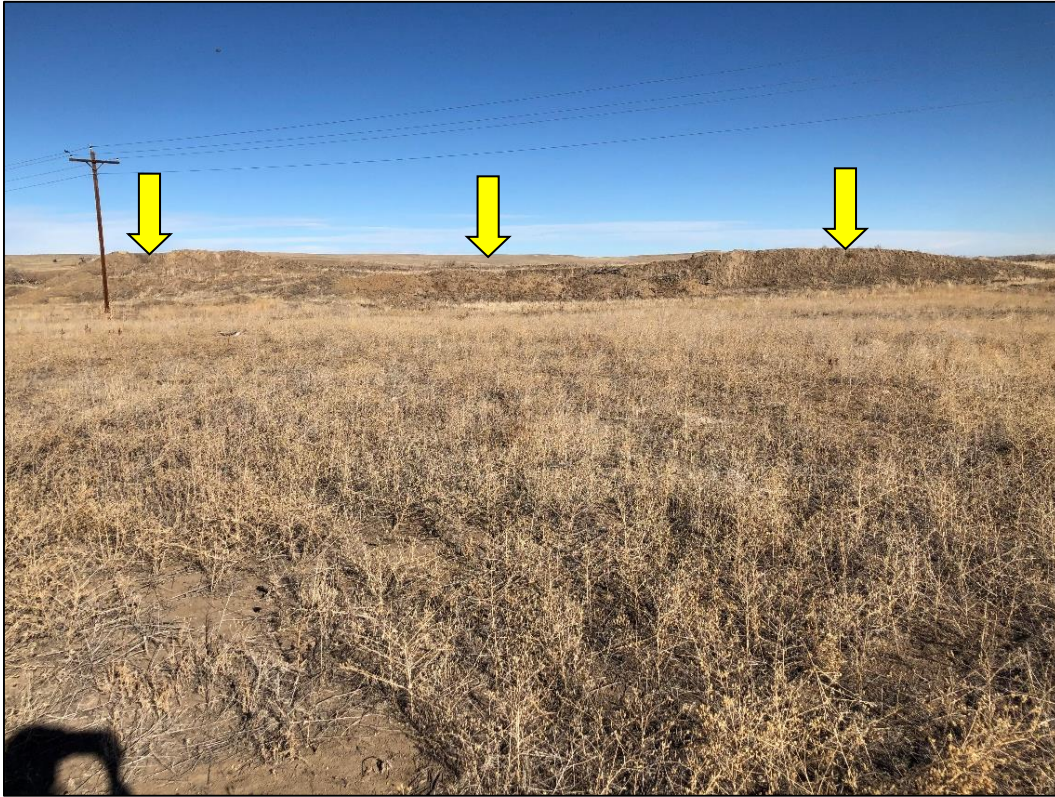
View looking north across backfilled north pit area, showing large topsoil stockpile stored along northern permit boundary (indicated in background). Vegetative cover in this area consists primarily of weeds.
